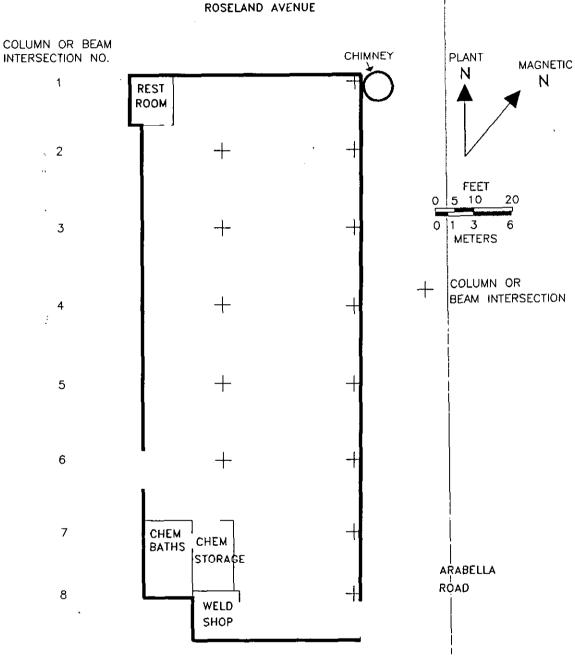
Building currently occupied by Meistermatic, Inc., at the site of the former McKinney Tool and Manufacturing Company. To facilitate reporting of results, the support columns or beam intersections were numbered 1 to 8.
